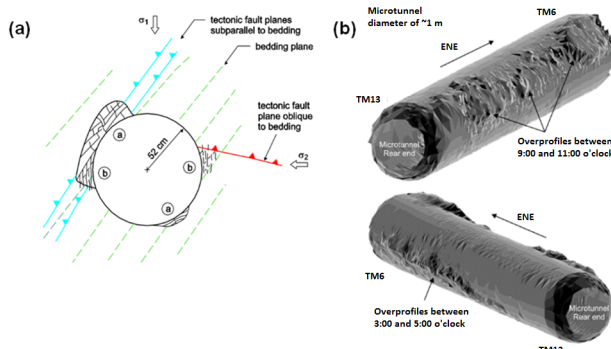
Damage zone around tunnel (a) schematic representation and (b) laser scans of the tunnel wall.⁴
